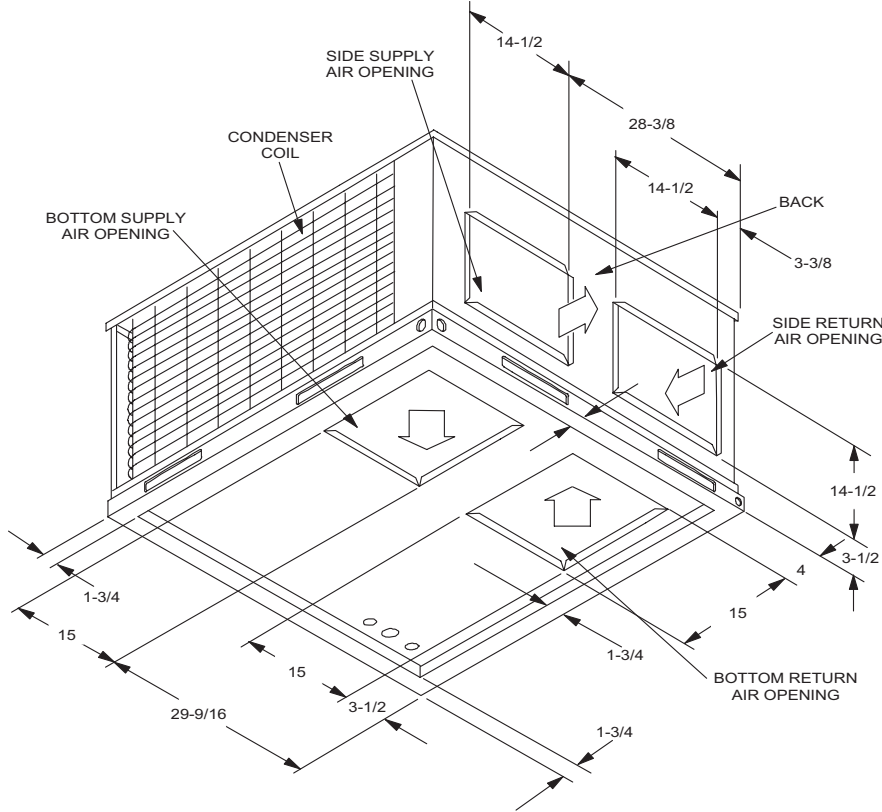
UNIT DIMENSIONS - BACK & BOTTOM
